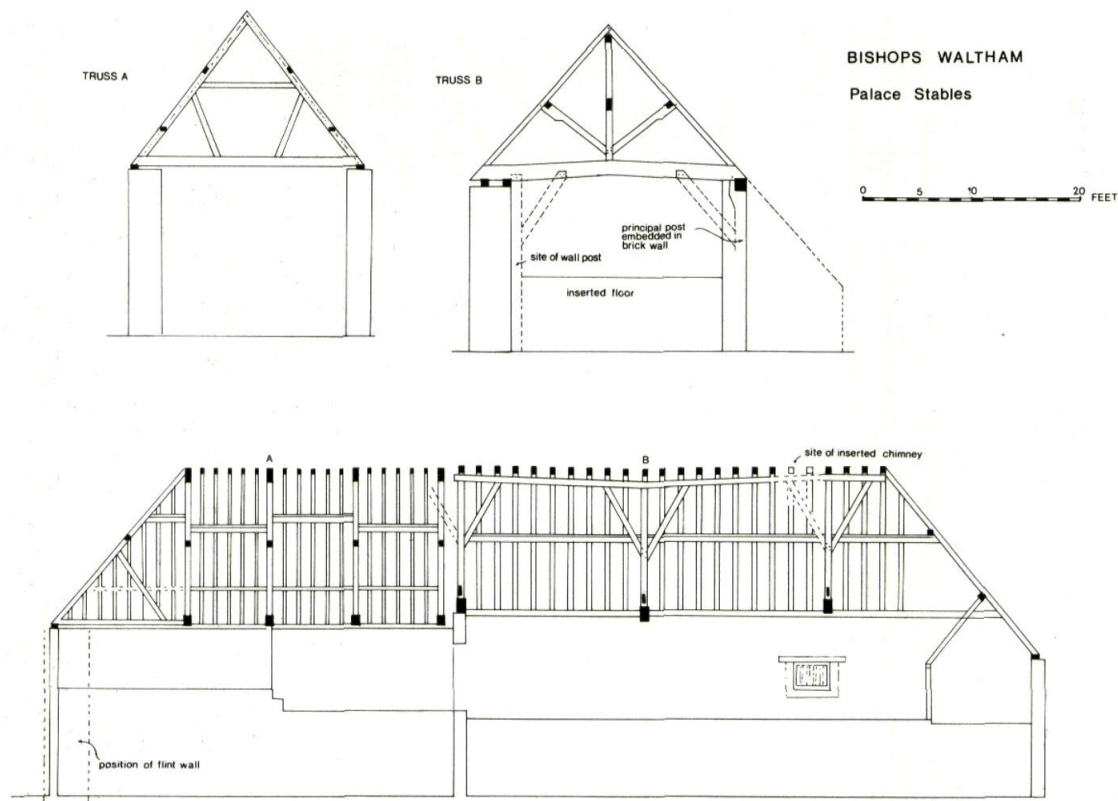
Bishops Waltham: site 5, the 'Palace Stables', sections of the standing building (R C H M E).
